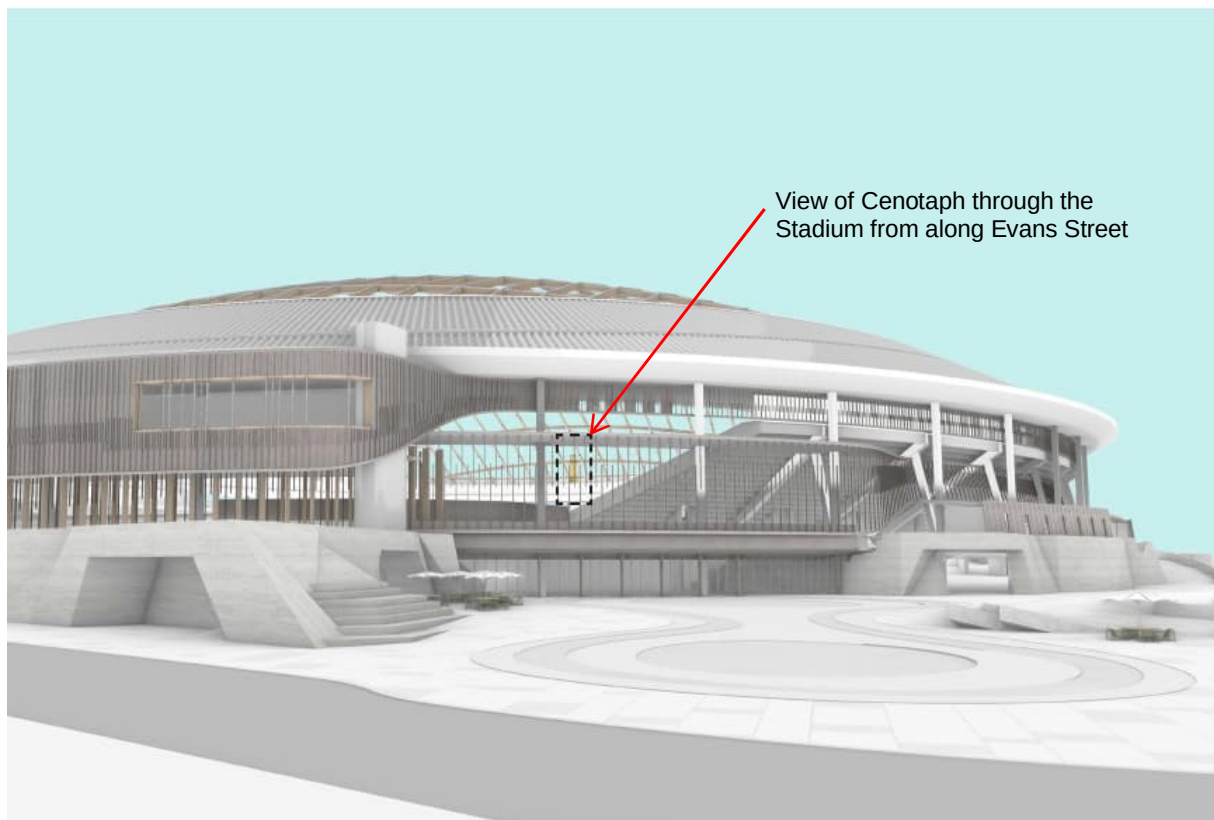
New views through the Stadium from Evans Street to The Cenotaph (COX Architecture)
